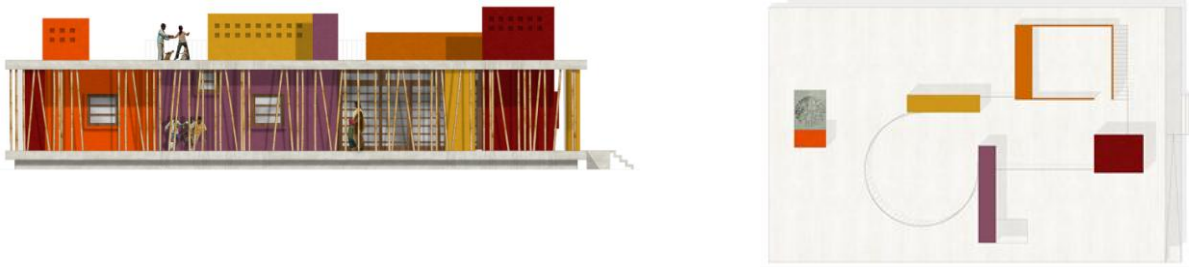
East elevation and Plan of Casa Rana, Thiruvannamalai
